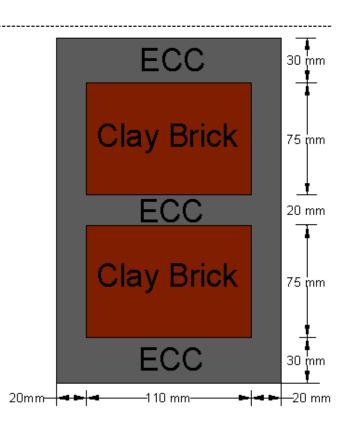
Cross-section of Masonry Beam with ECC as Bed Joint (S. B. Singh et.al)
